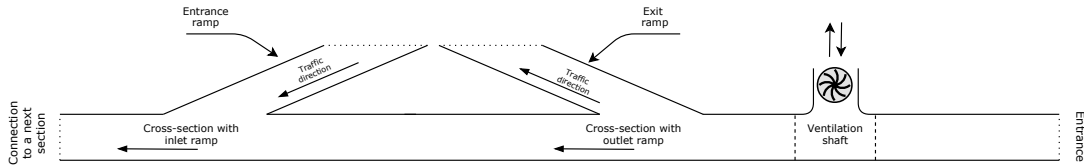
Schematic illustration of the tunnel cross-section with inlet ramp and outlet ramp U Vorlíku and a place for both airflow extraction and fresh air supply. Traffic direction is denoted by arrows.
